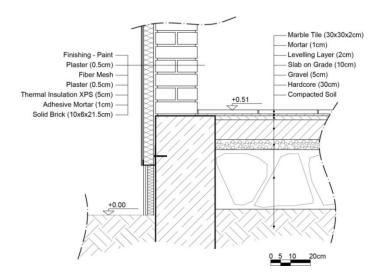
Section of Ground Floor and Exterior Wall after Retrofitting
